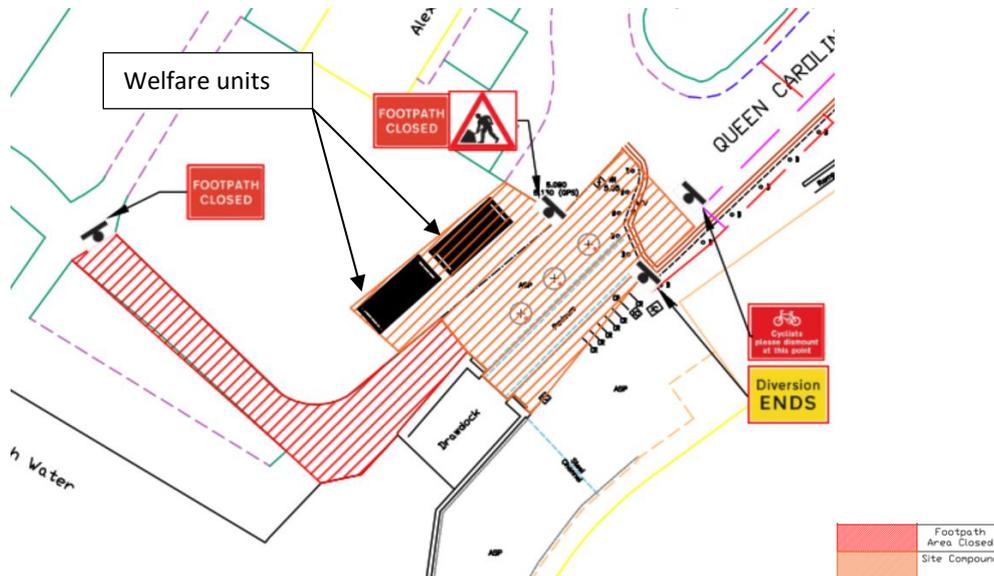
Footpath Closure on north side of Hammersmith Bridge
